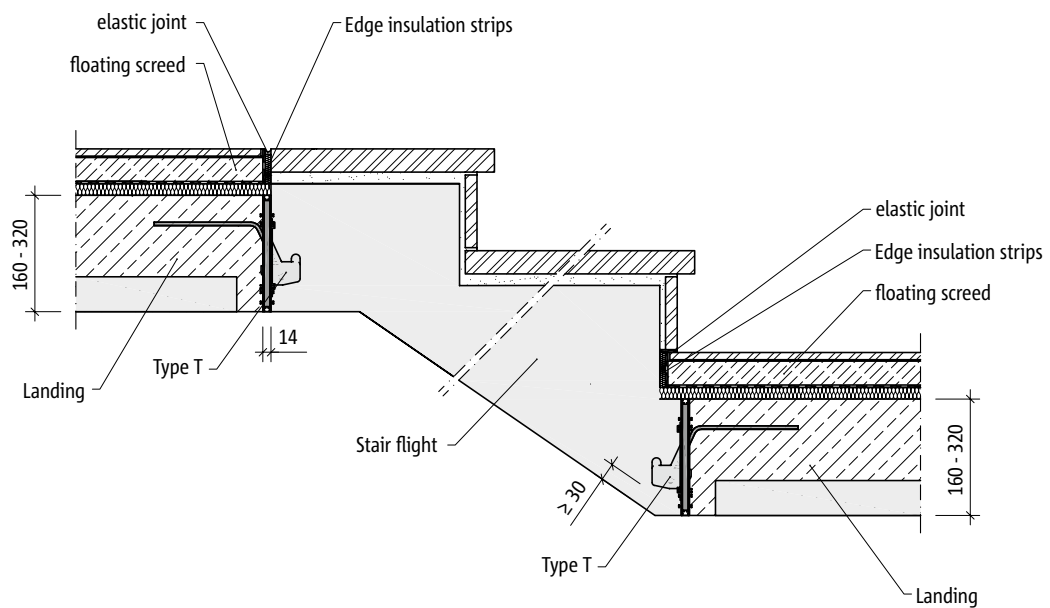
Schöck Tronsole® type T: Installation cross-section precast stairs with semi-precast landing
